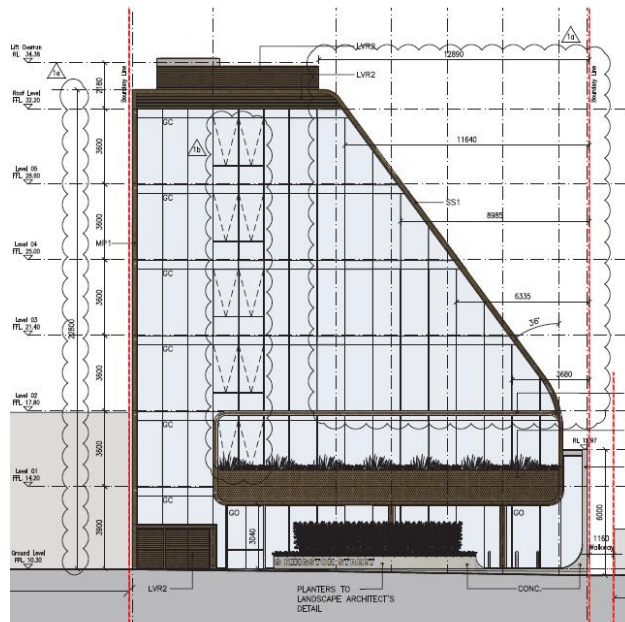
Endorsed south elevation of No. 9 Kingston St, Richmond (PLN19/0025). Not yet under construction.
